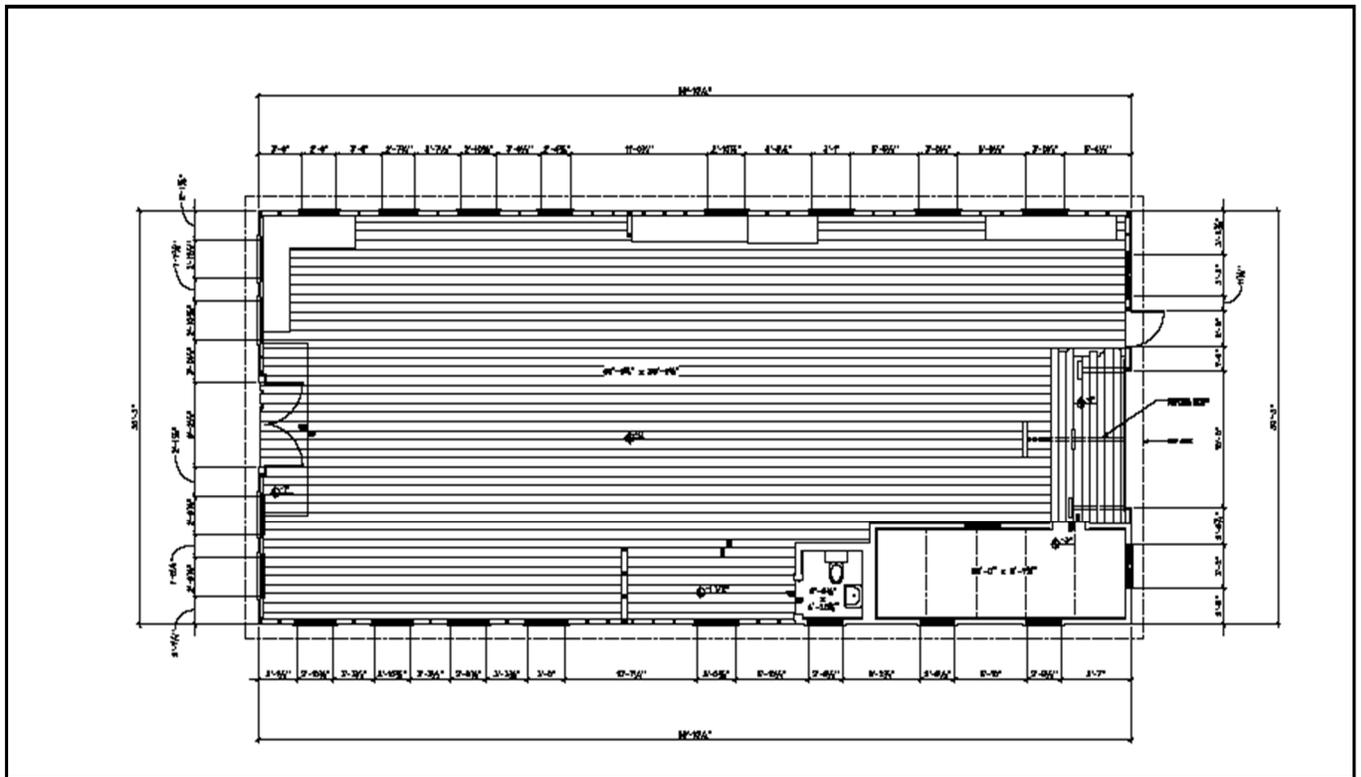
Floor Plan of Braselton Tire Company – Façade/Front Facing to the Right
